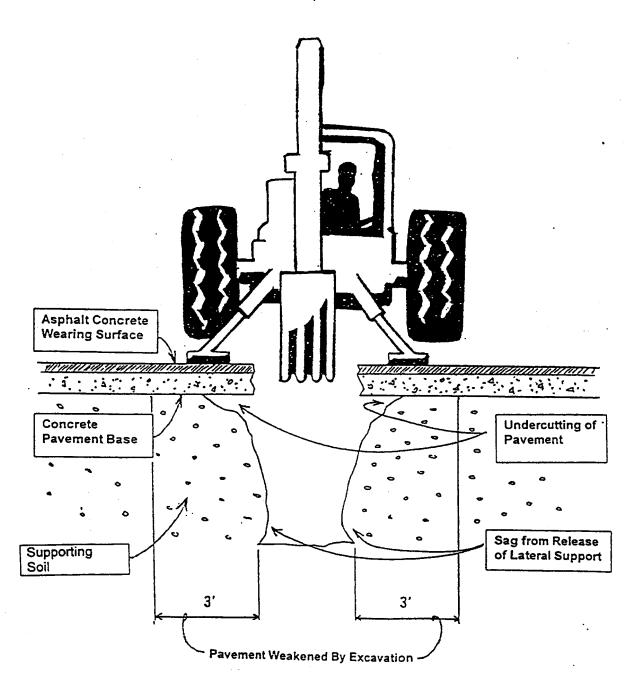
Typical Trench Excavation (Impact of Excavation on San Francisco Streets, September 1998)
